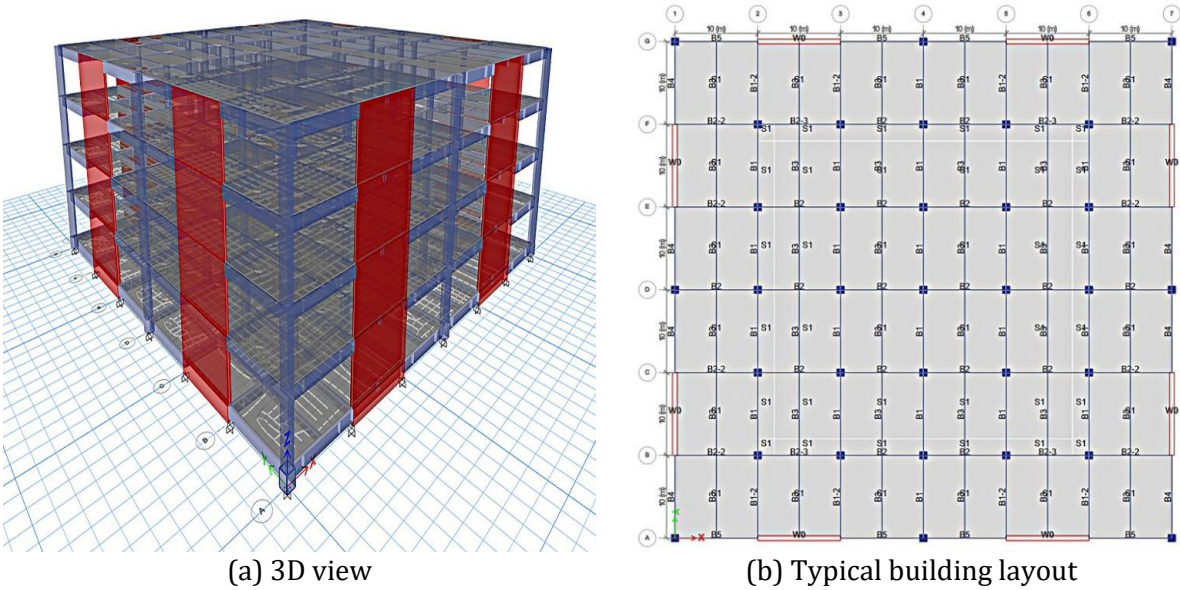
Finite element structural models for Model 1 and Model 2: (a) three-dimensional view; (b) typical building floor layout
